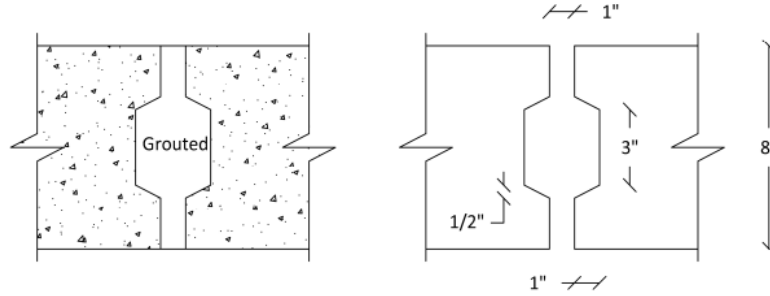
Cross section view showing shear key for abutment module to abutment module connection. (Unlu, 2010)
